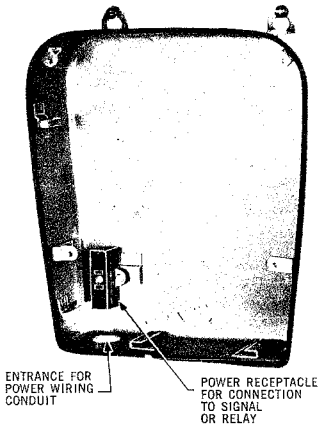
NS-16301-Type Back Box, Conduit Installation
